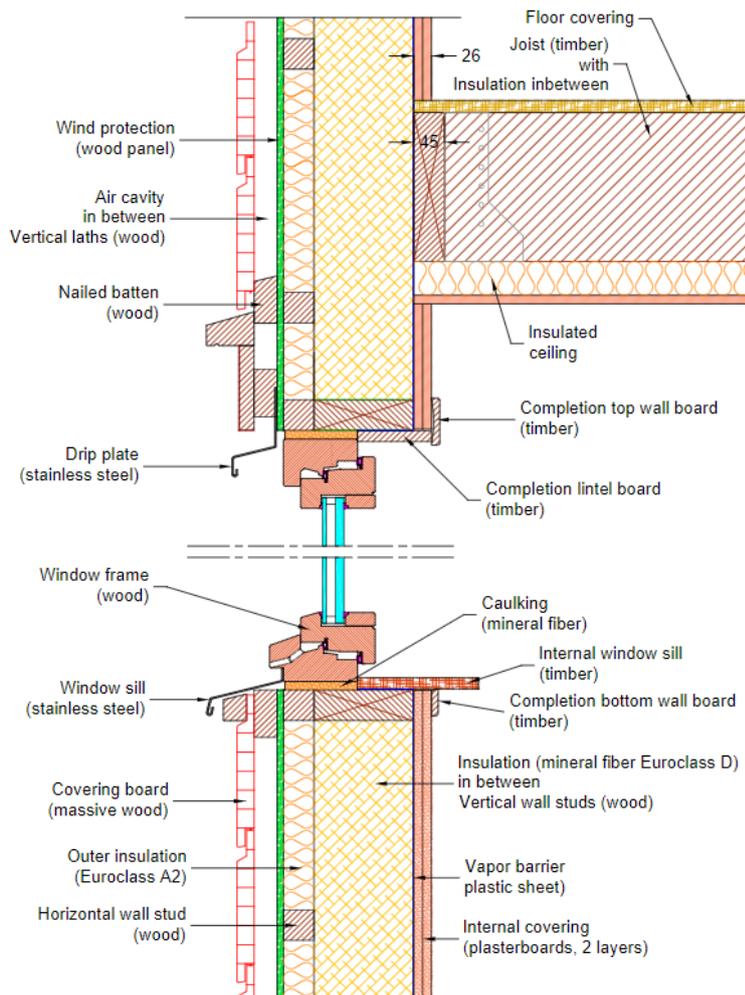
Example of test specimen for round robin on ventilated wooden facade.
